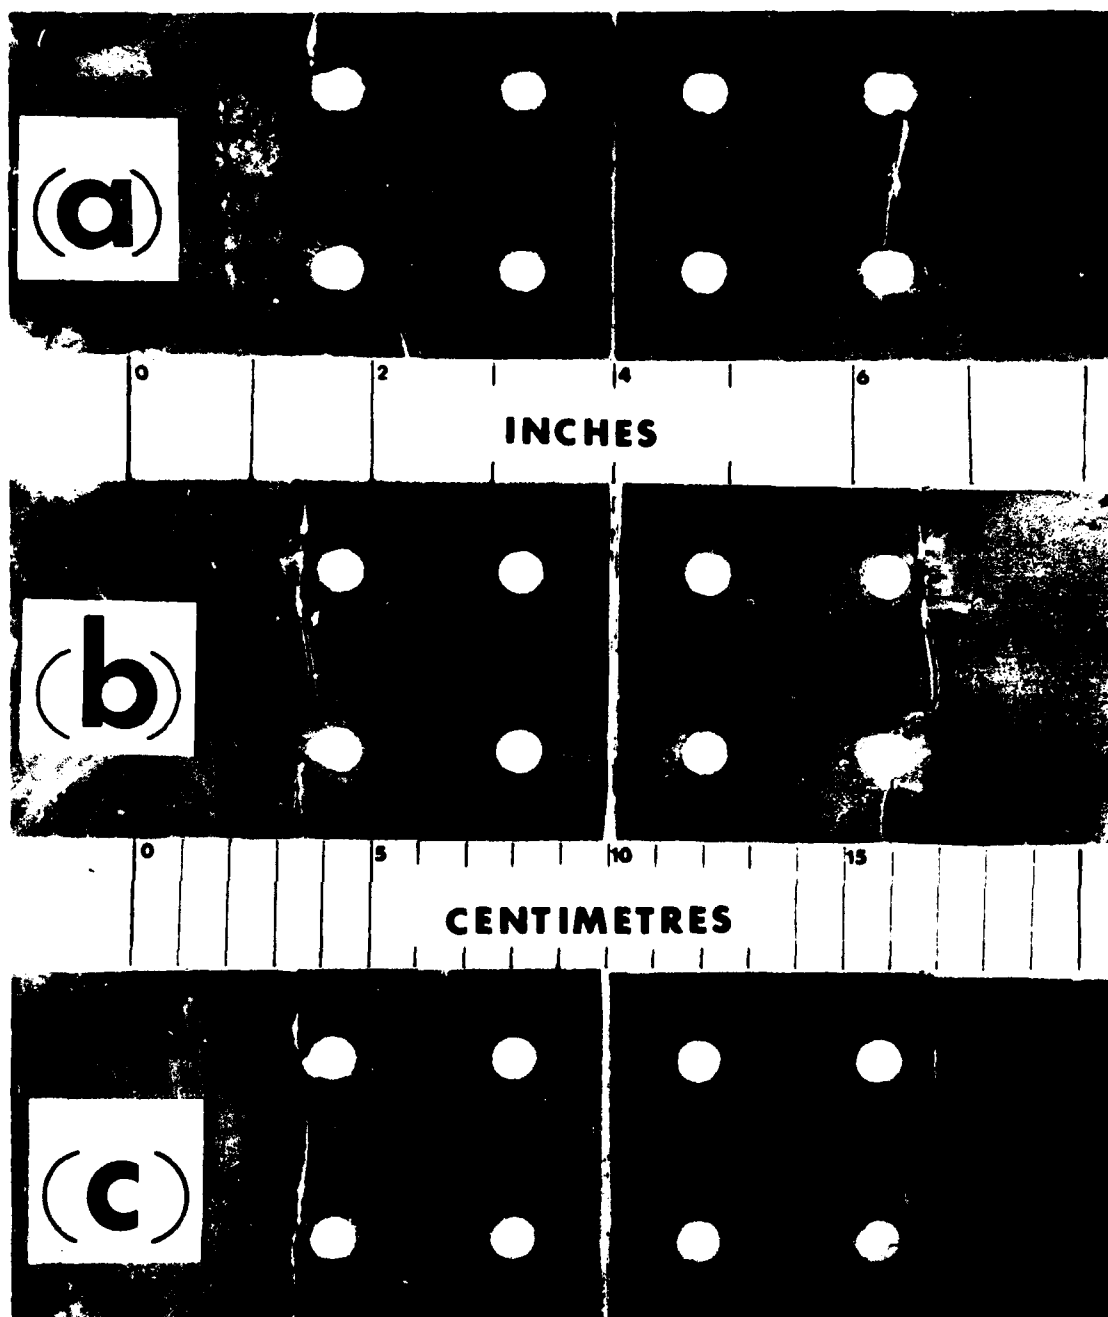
4-PIECE TIGHT BOLICONE SPECIMEN
